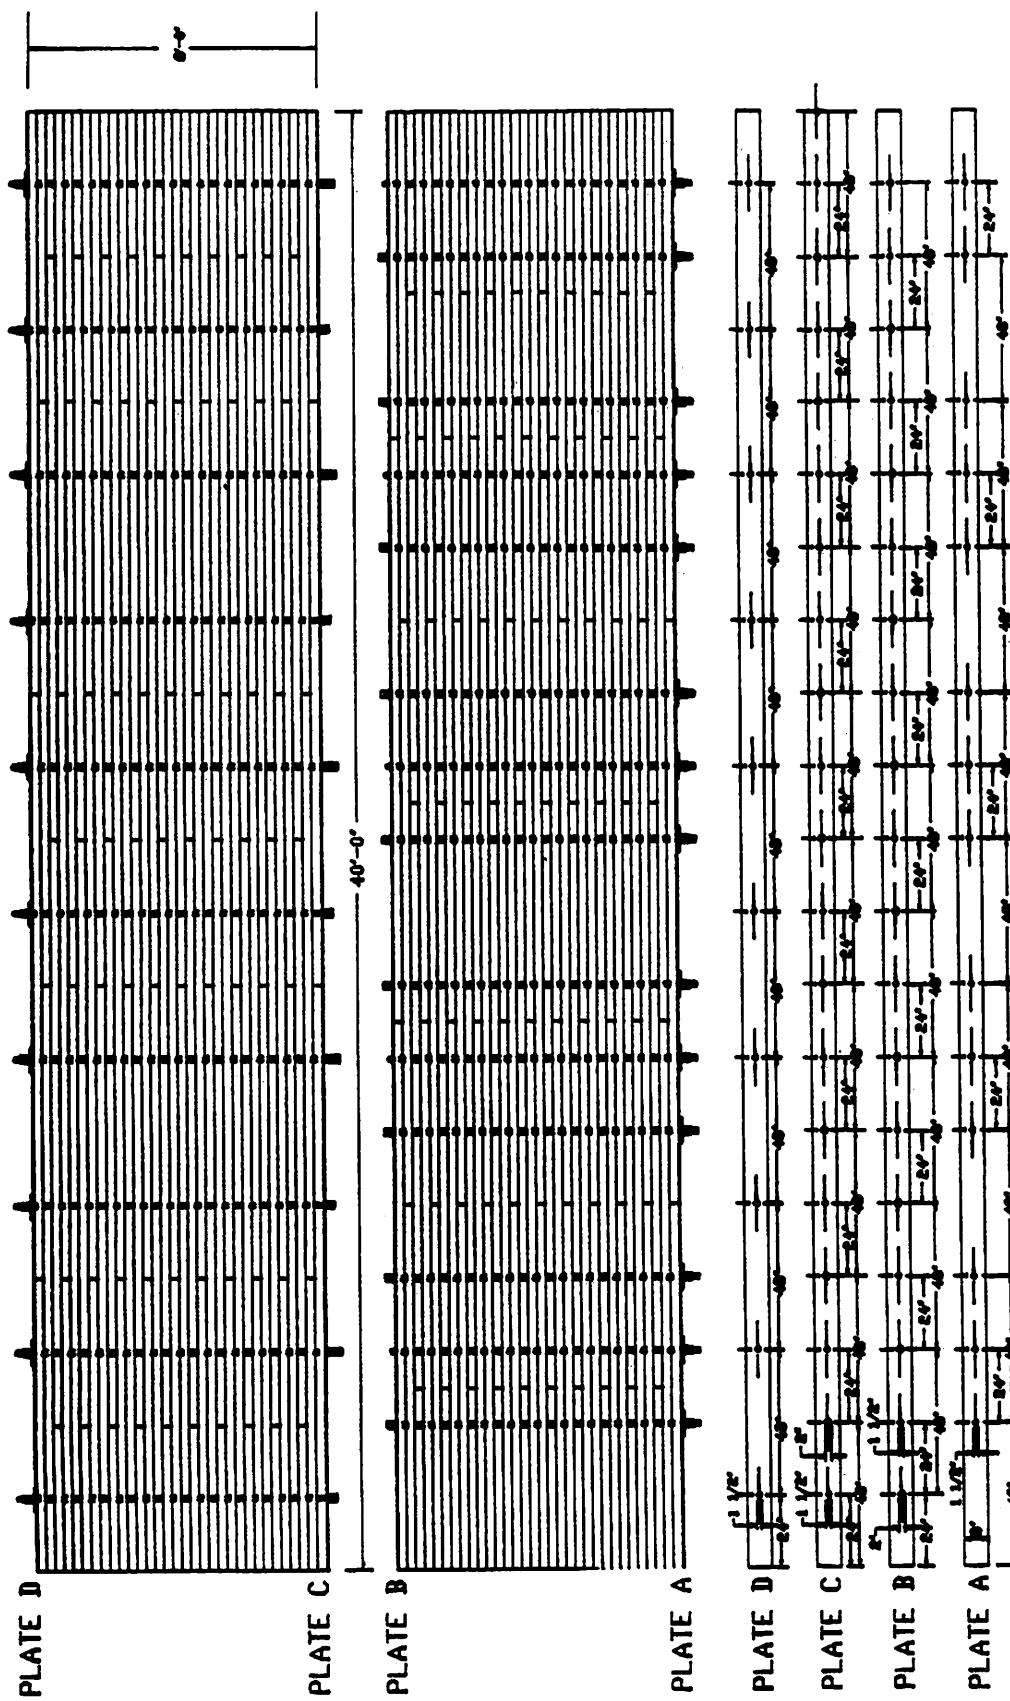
SCHEMATIC OF W.V.U. TEMPORARY BRIDGE
